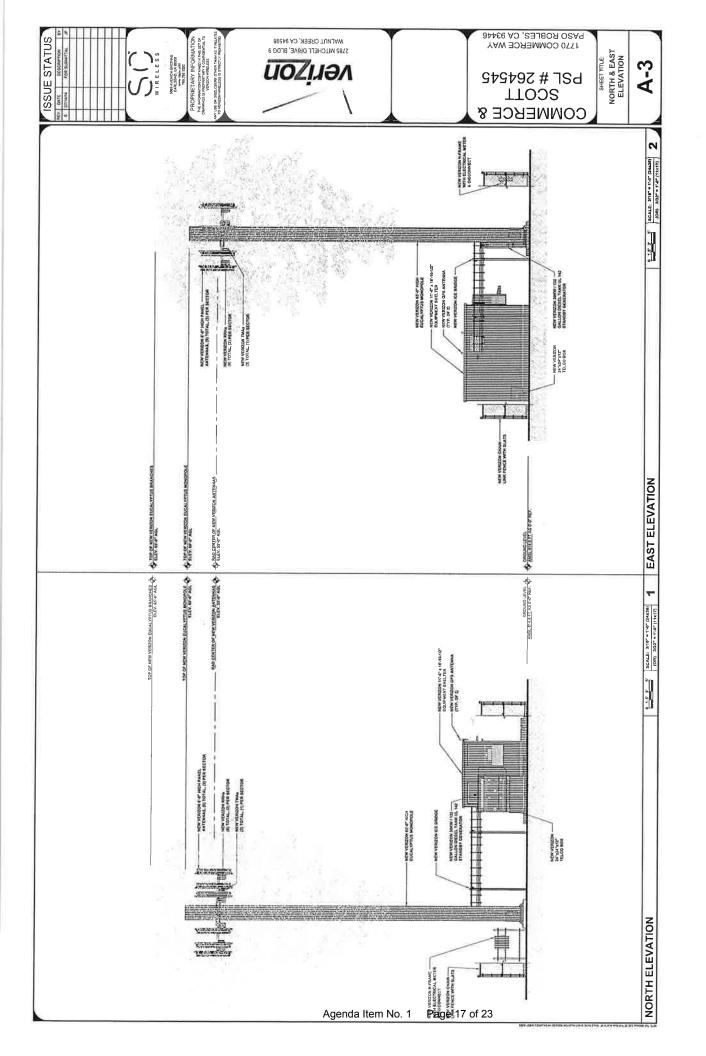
## Exhibit A Site Plan CUP 14-008 (Verizon - Commerce Way)
